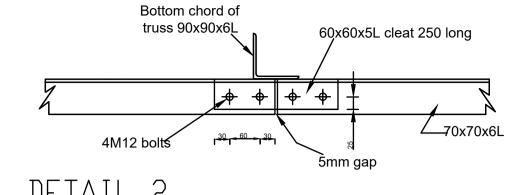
LONGITUDINAL TIE FIXING DETAIL
